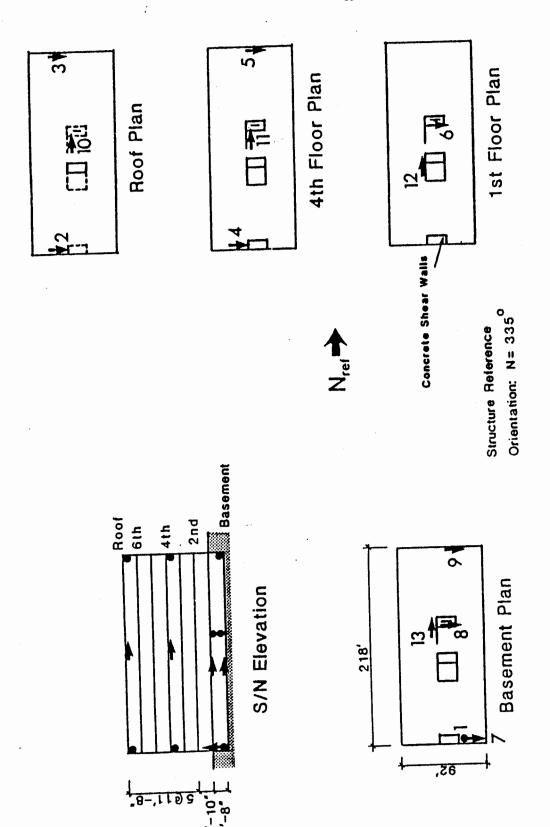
General Layout of Building CSMIP462 (Shakal, et al., 1989)
